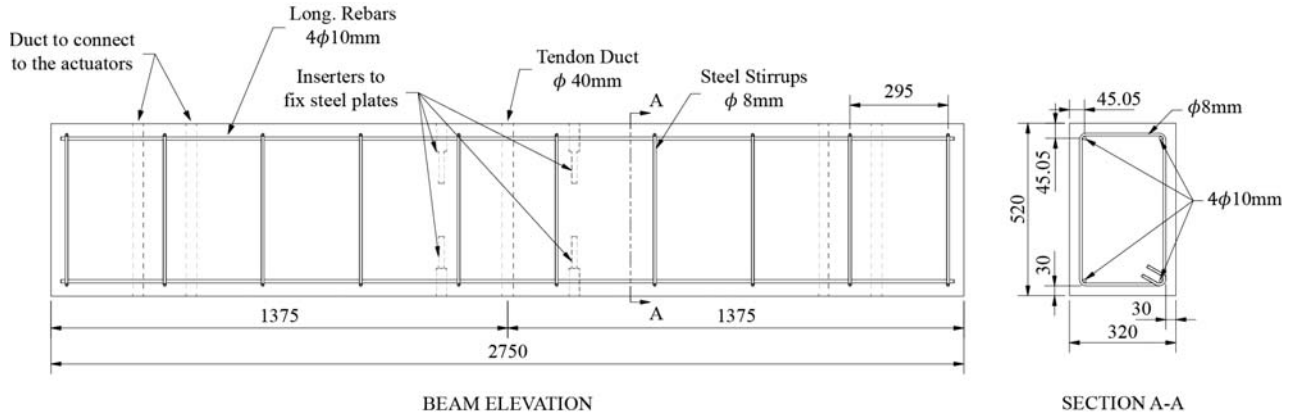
Cap-beam elevation and cross-section (dimensions in mm)
